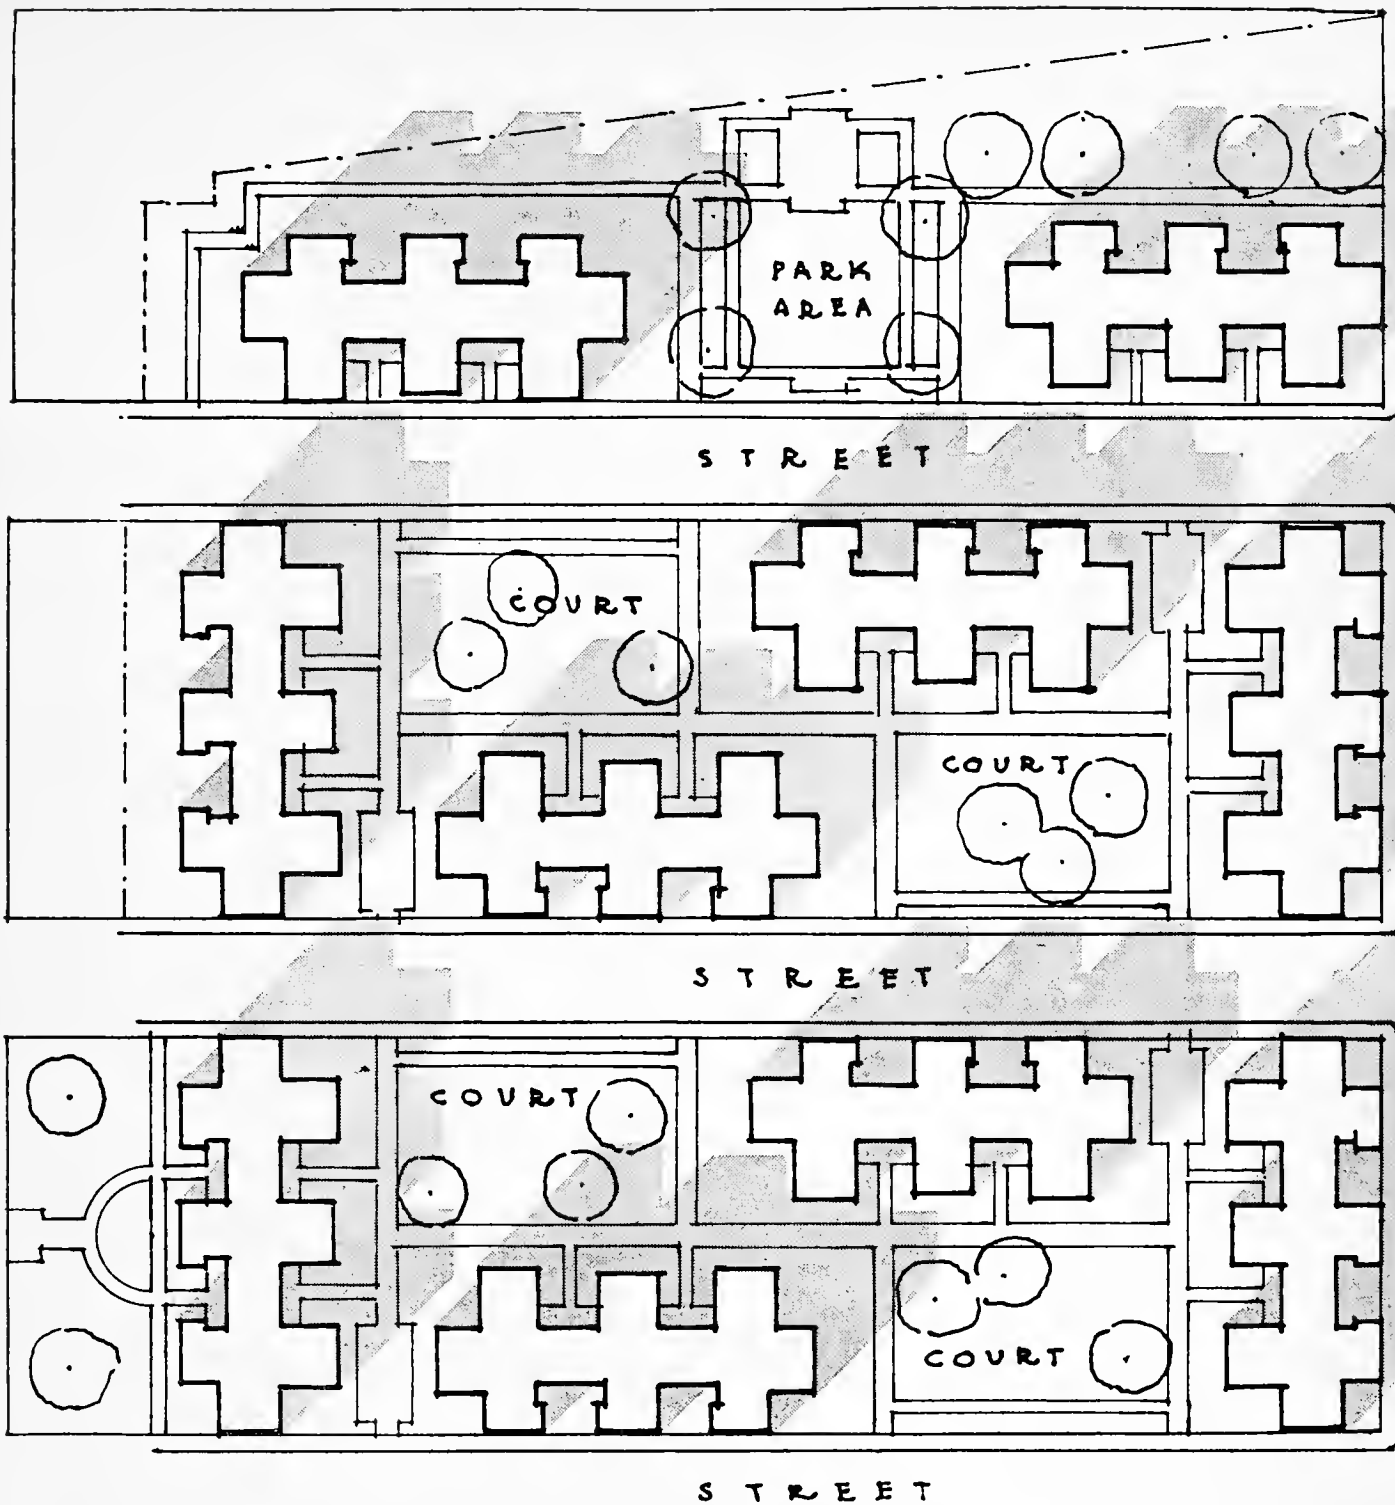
(opposite page). Imposed street pattern. First study of site plan. Figure 134 (above). A later study of site plan. Springsteen & Goldhammer, architects.
